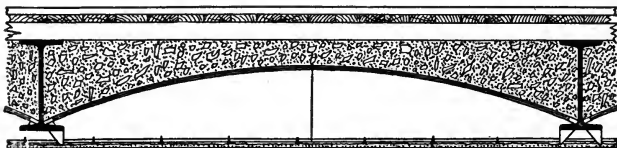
Roebling Concrete Floor Arch with Suspended Ceiling.
